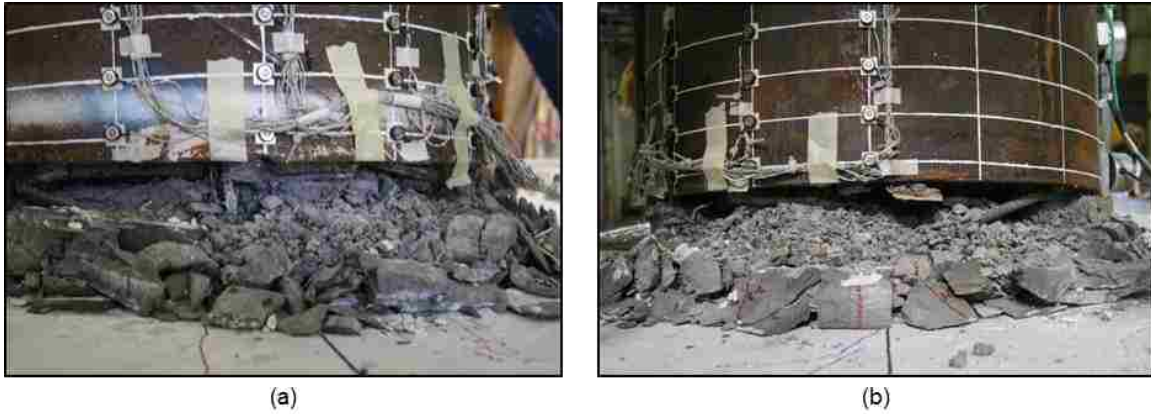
WRC South (a) reinforcing bar fracture, and (b) Cap beam concrete uplift at 9.40% drift North
